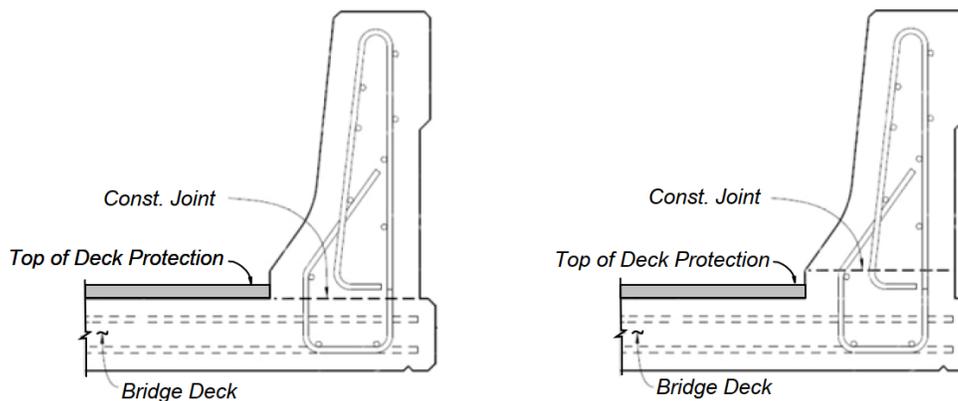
Alternative Construction Joint Placement of Deck/Barrier Interface
